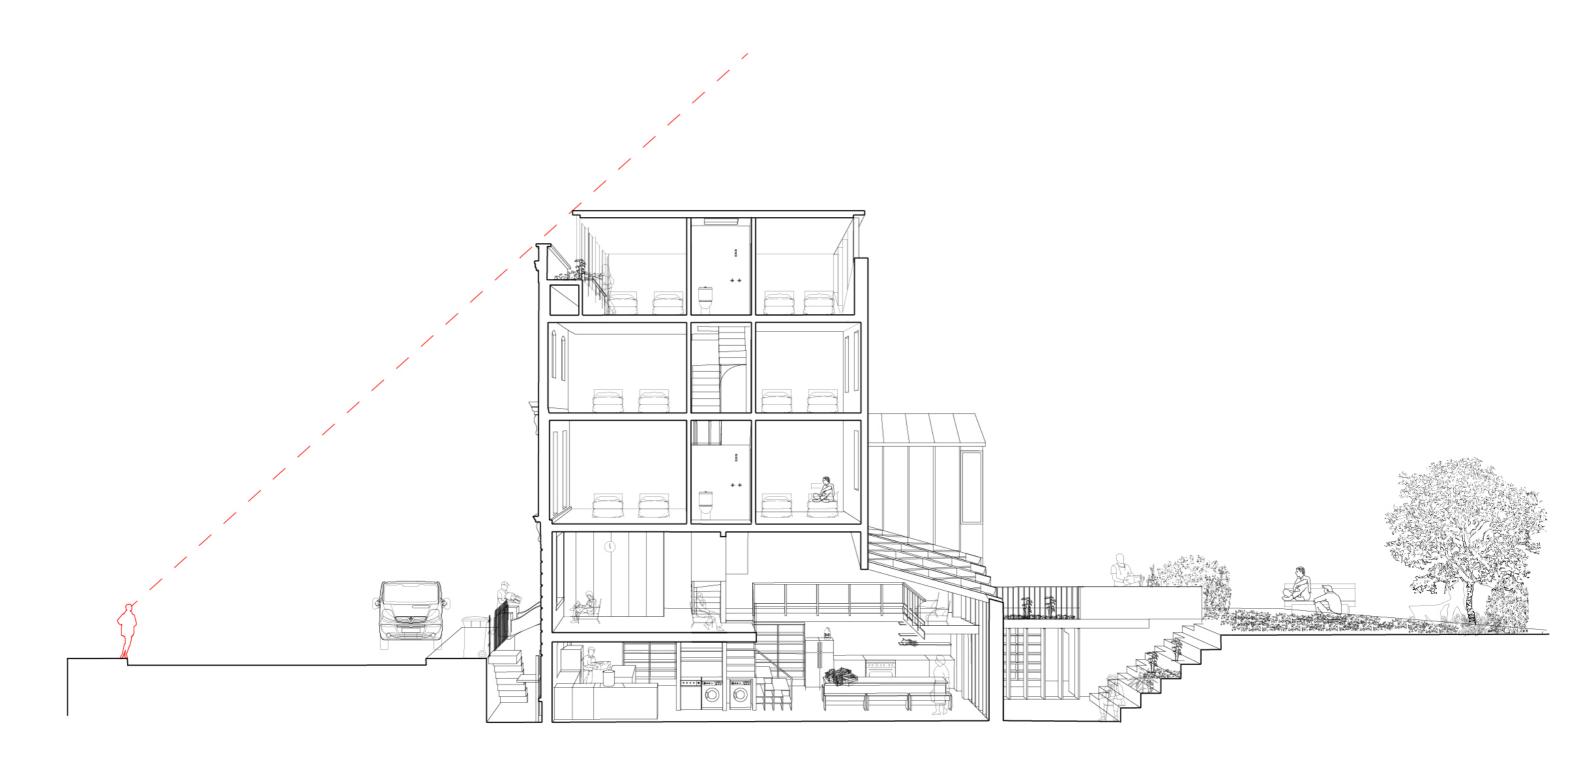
Proposed Perspective Section - Third Floor Extension set back from front facade to minimise views from street level on Malden Road
